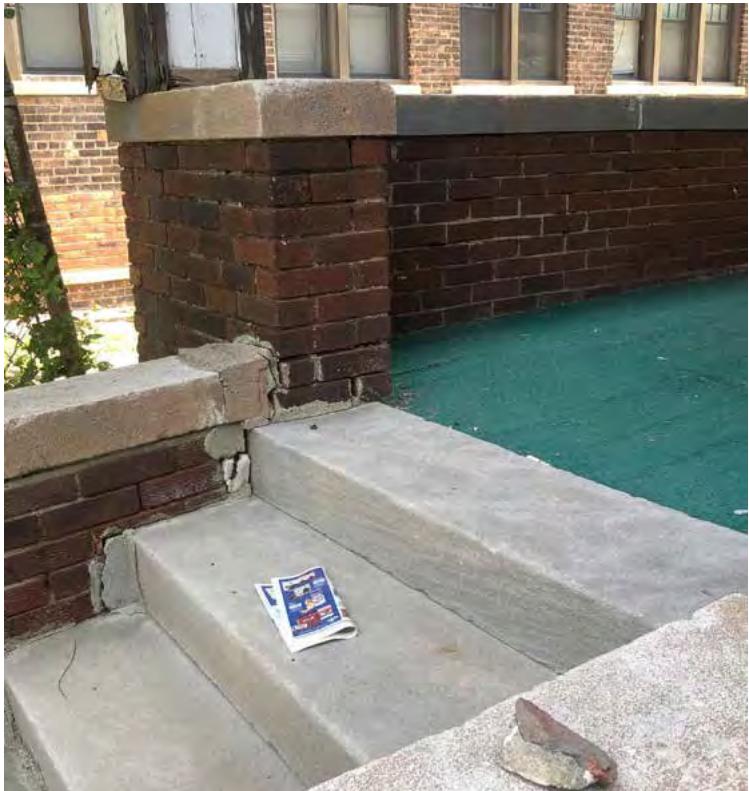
PHOTOS OF CONDITIONS OF PORCH AND STOOP
